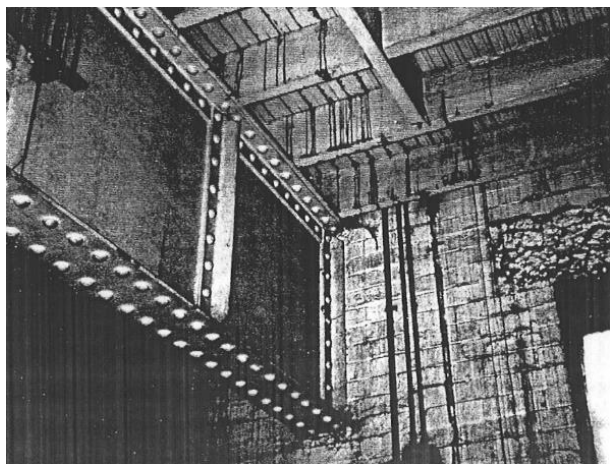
Detail of riveted steel beams, timber floor structure and brickwork, 1991
